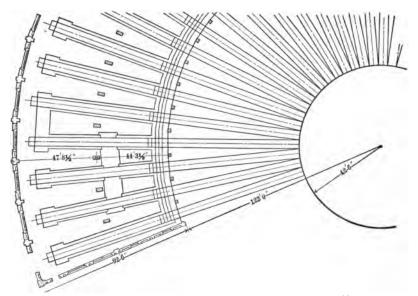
(Continued). Partial Plan, 35-stall Engine House, A. T. & S. F. Ry.
